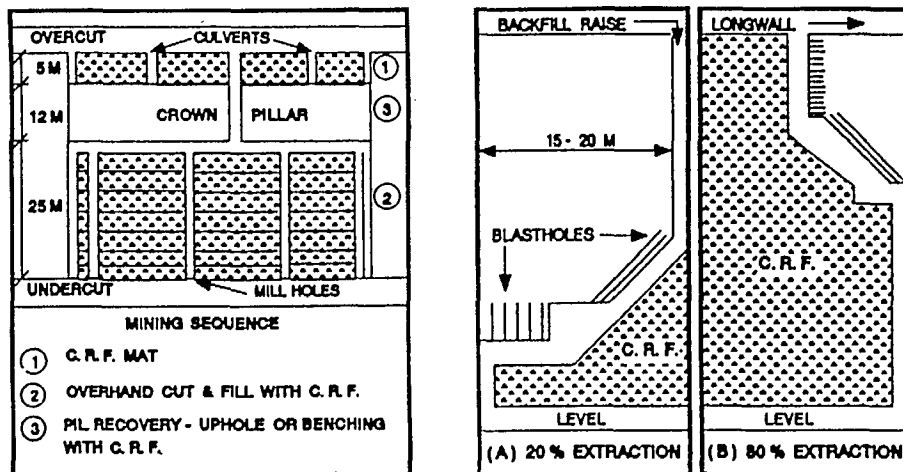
New mining layouts being used with cemented backfill at the Macassa Mine
